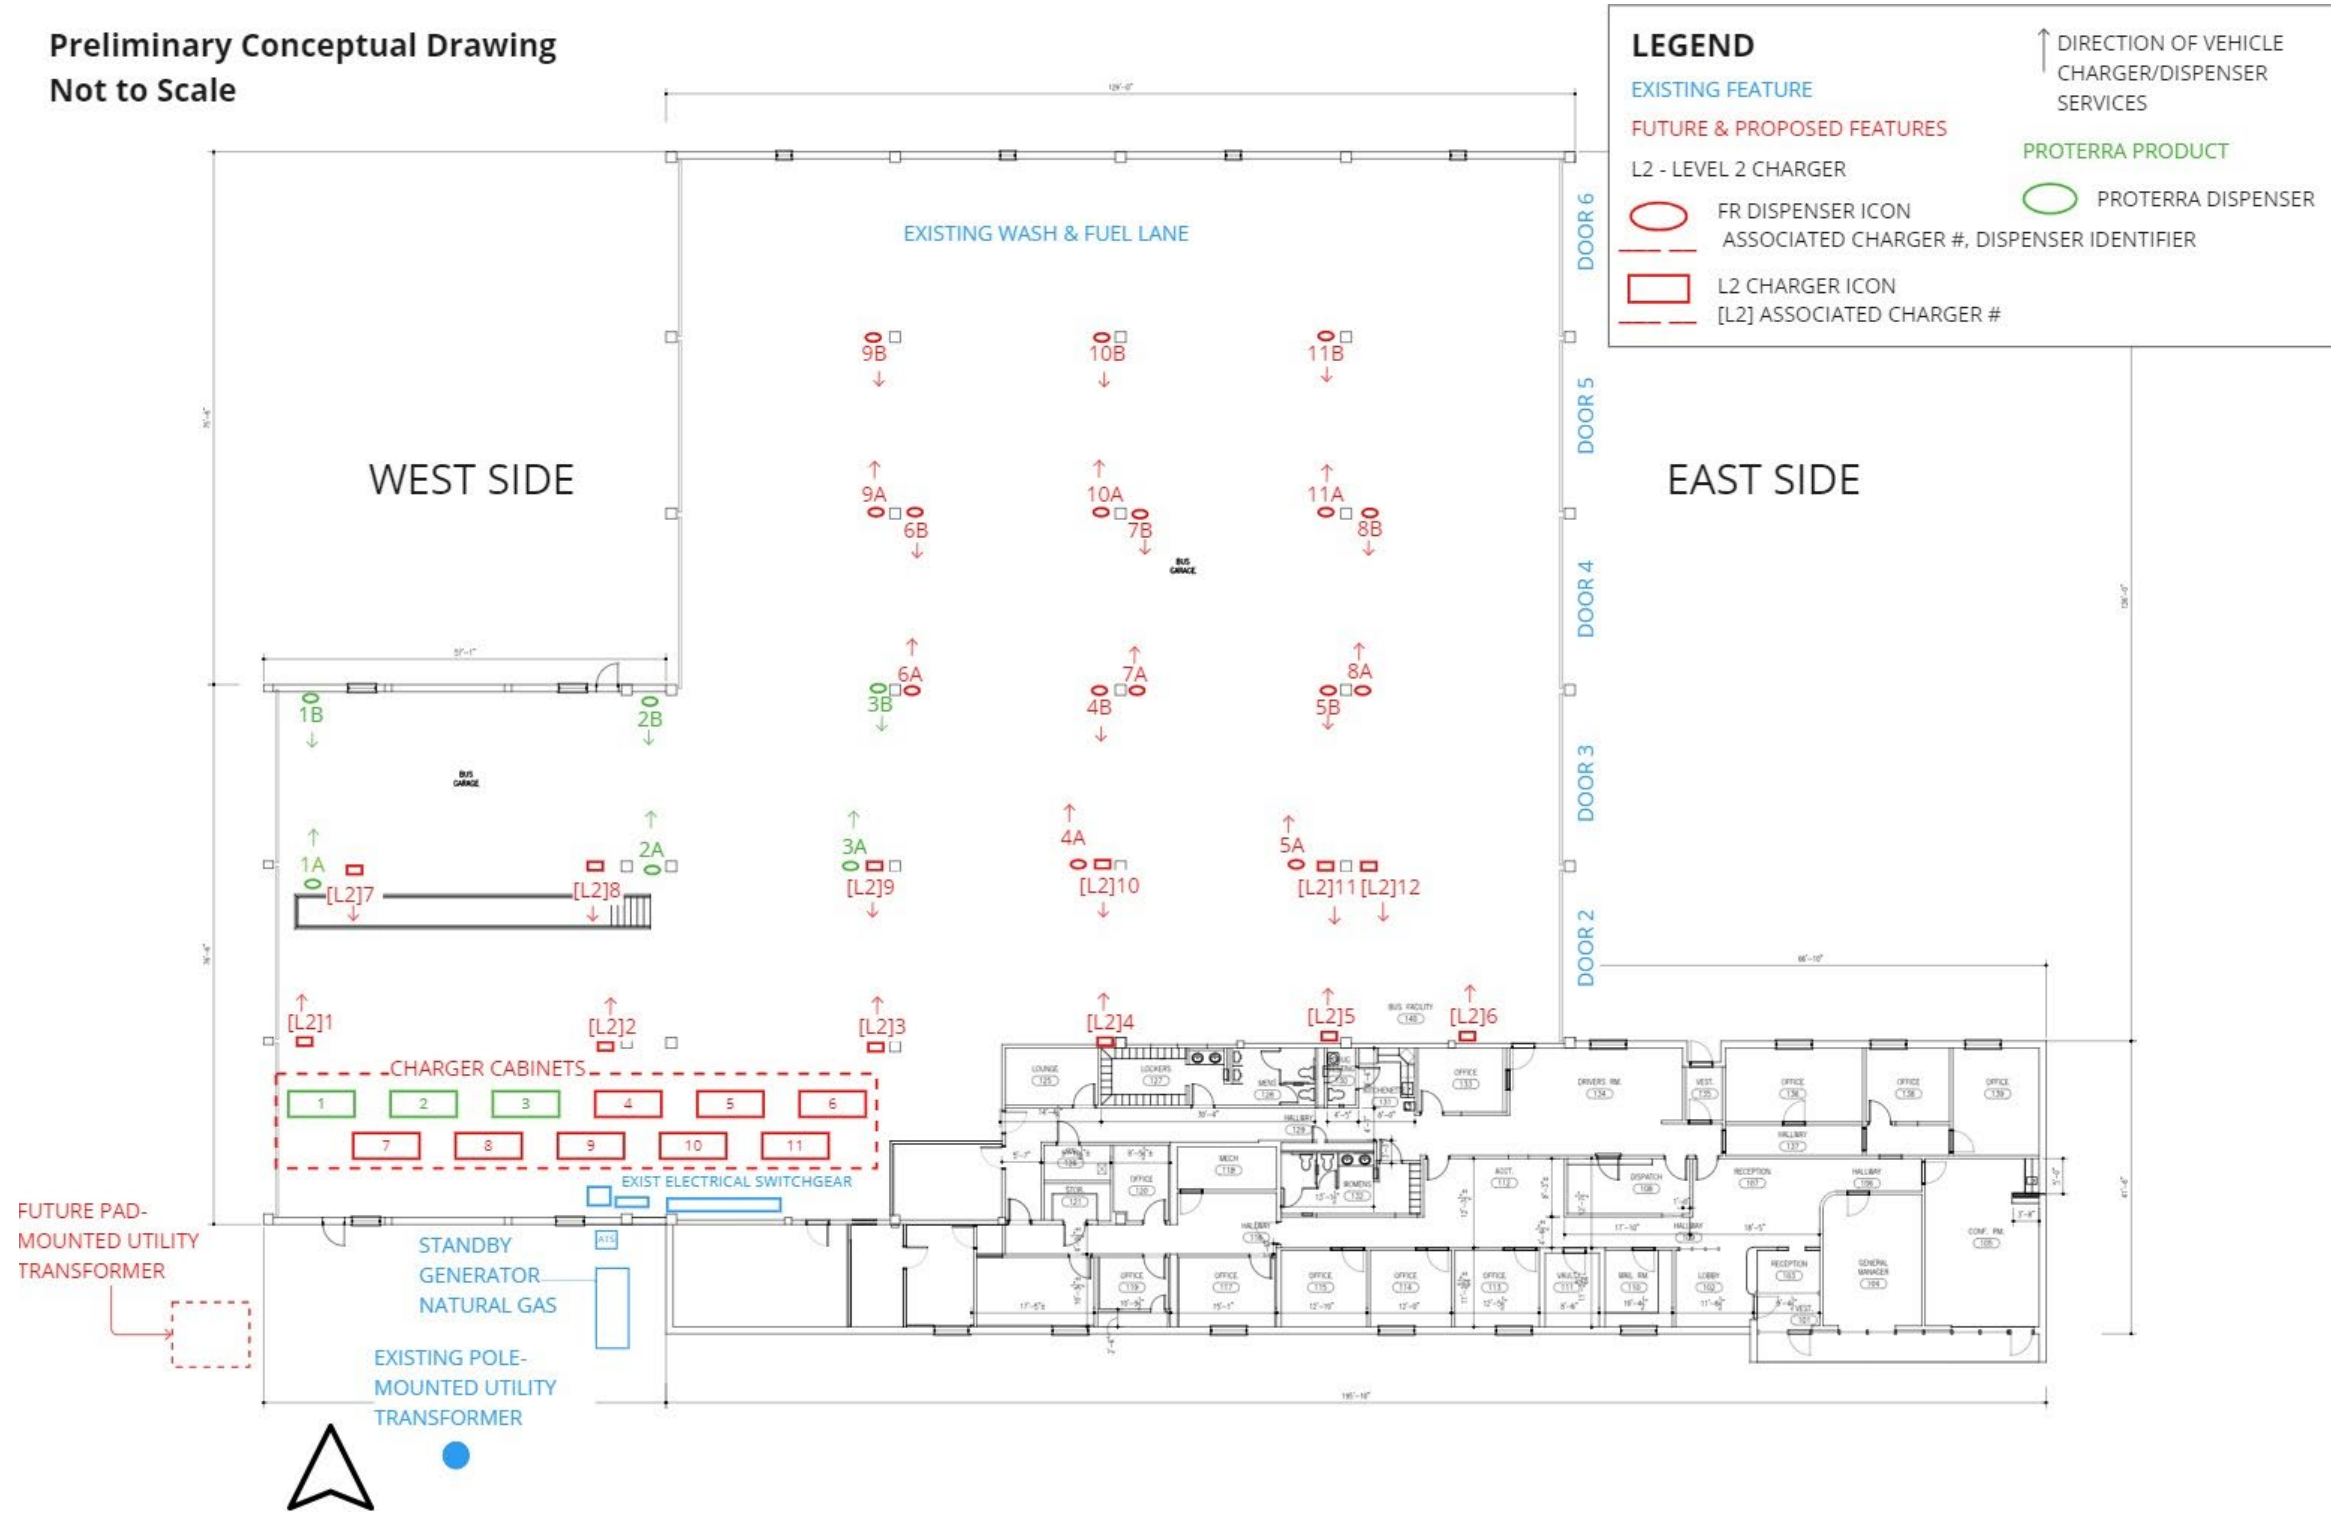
Ryan Building Facility Proposed Retrofit Layout
